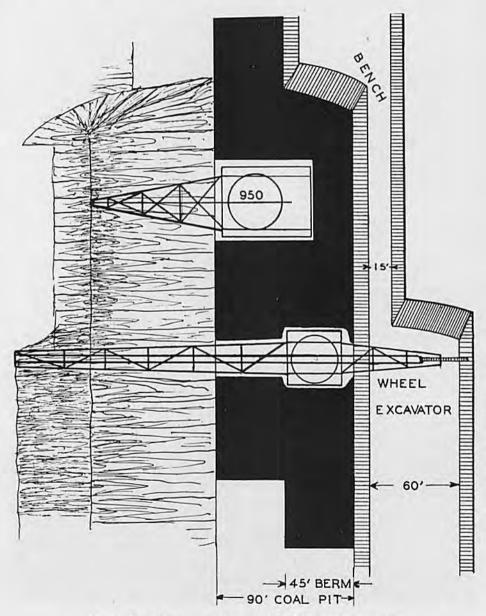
Plan of working tandem units-United Electric Buckheart Mine
